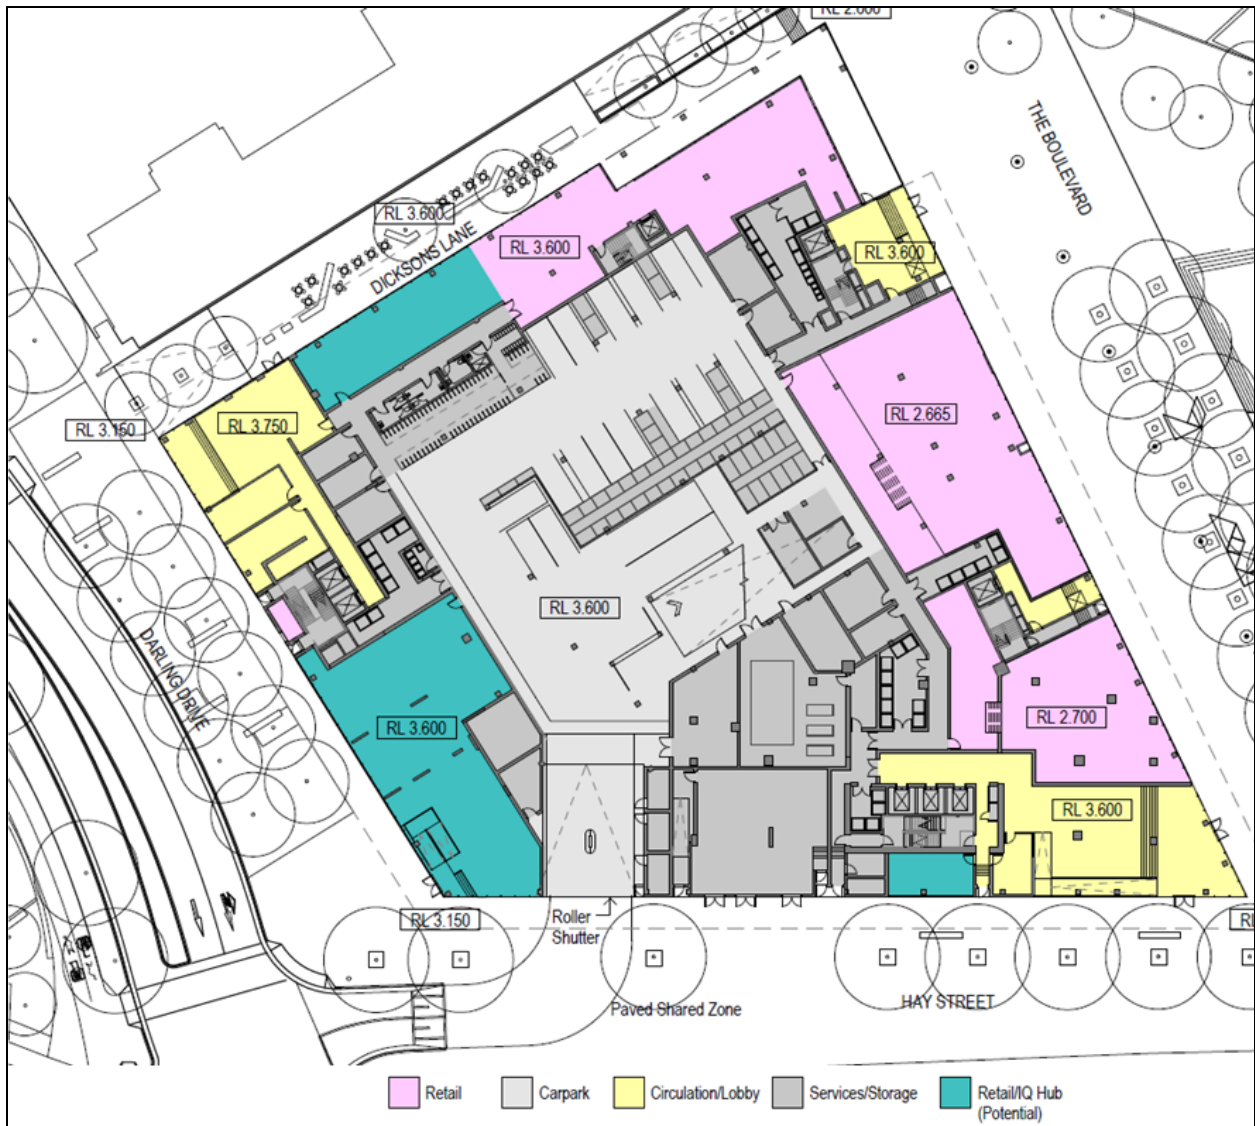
Ground floor floorplan layout (Source: applicant's RtS)
